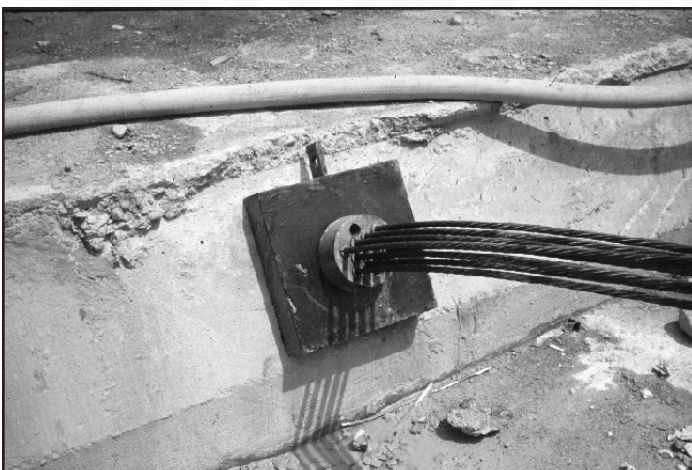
Ten or 18-strand tieback anchors installed on the cap beam were stressed using hydraulic jacks.
